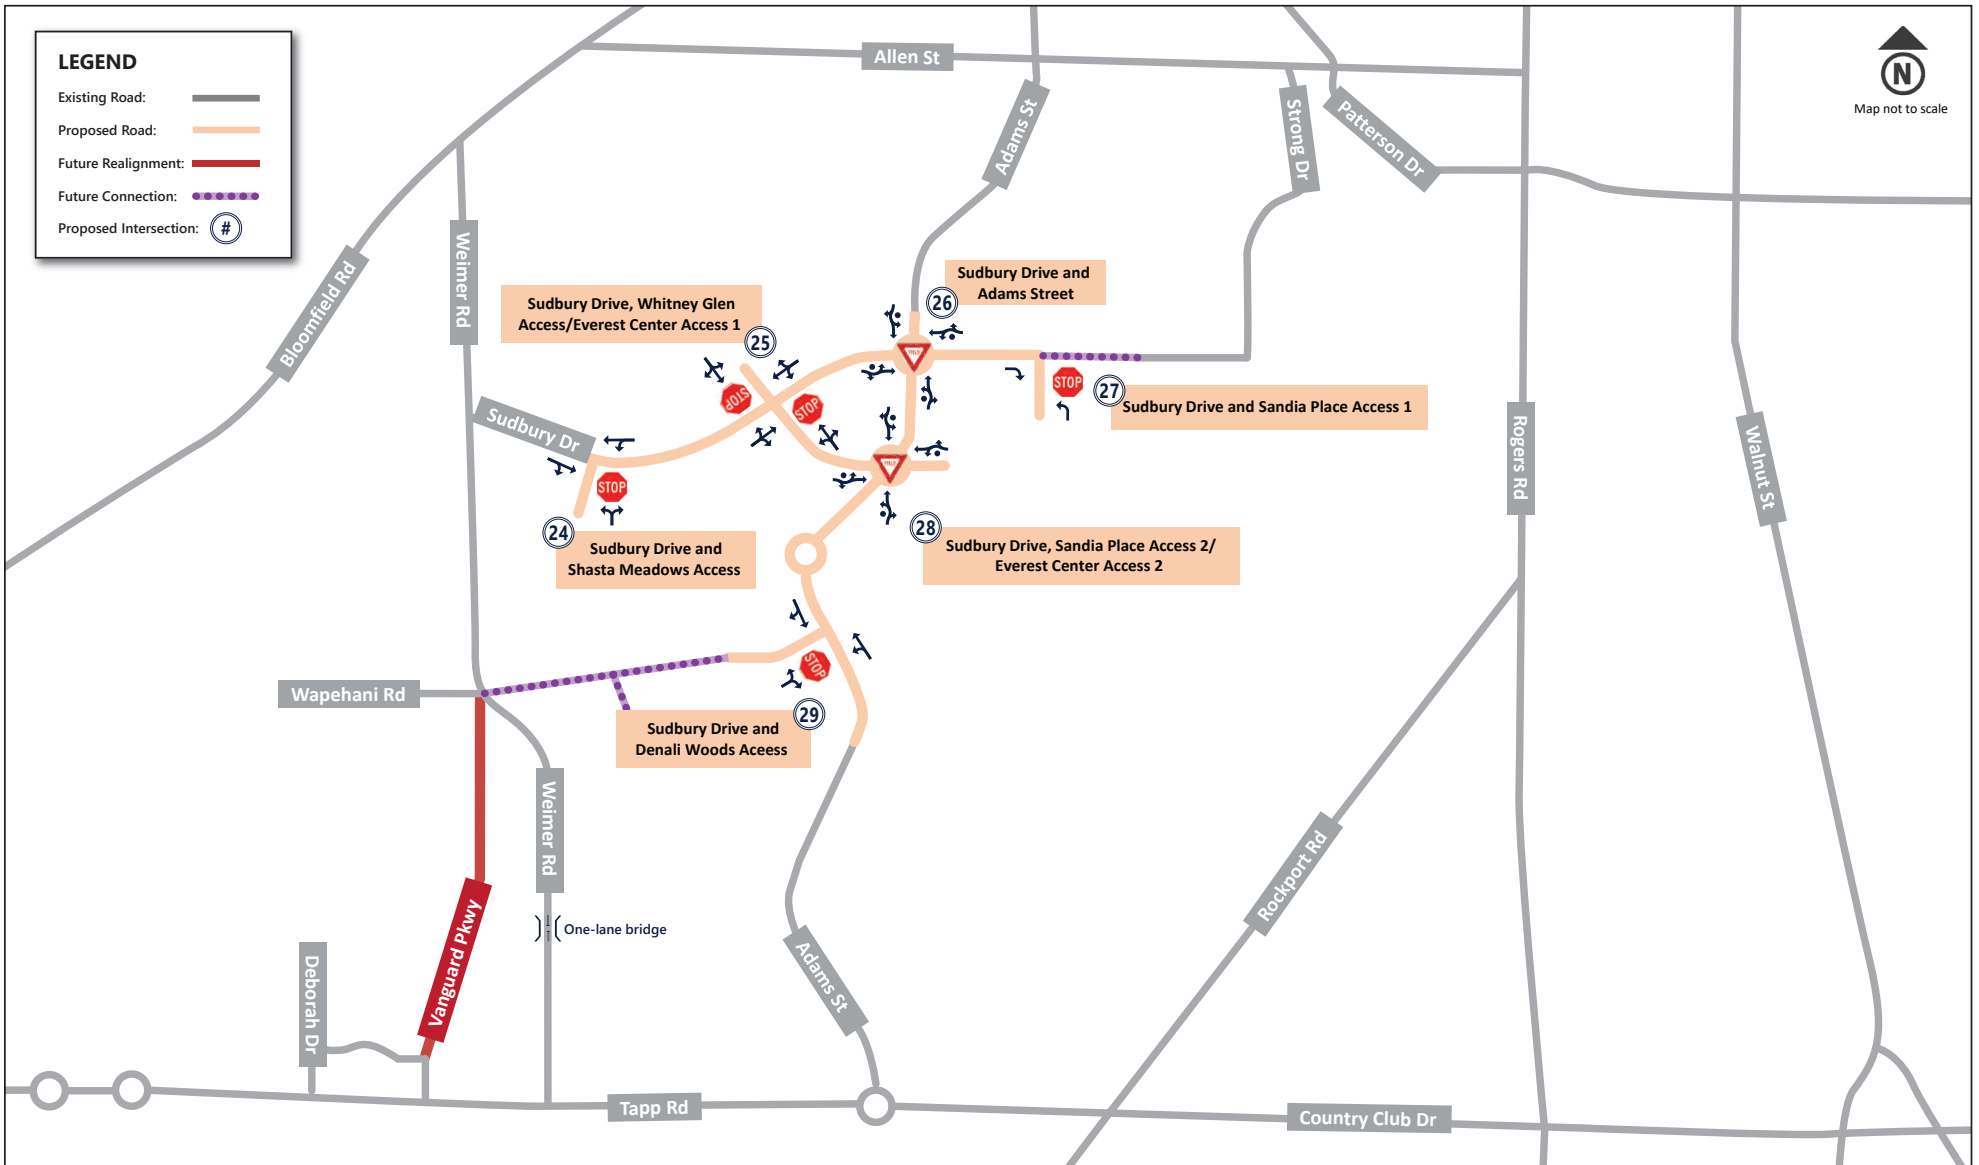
Proposed Intersection & Future Weimer Road Re-alignment
